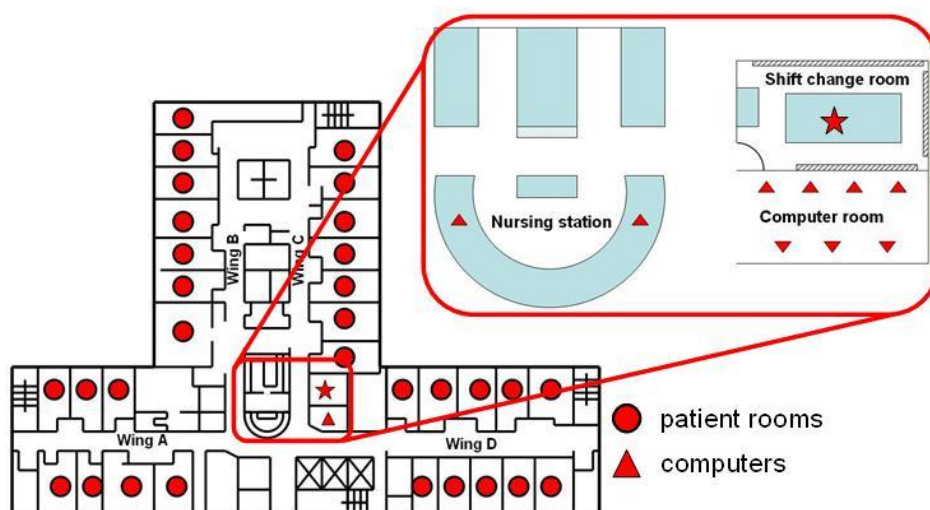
(bottom left) Floor plan of the W21C, (top right) Layout showing the nursing station, shift change room and computer room.
